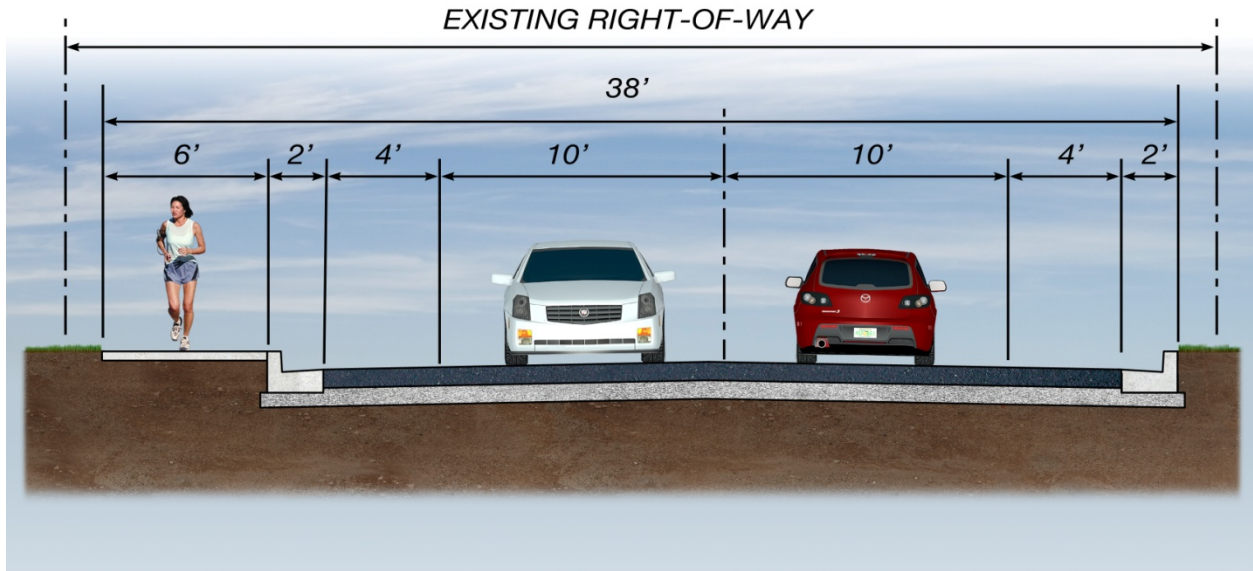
Proposed Roadway Section West of Proposed Movable Bridge
